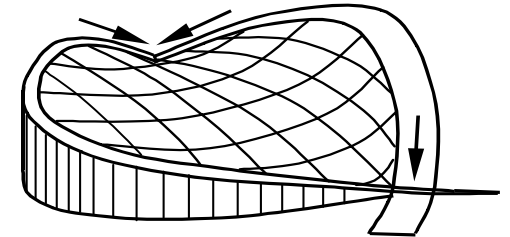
Suspension roof with parallel suspension cables, supported by crossed arches.
